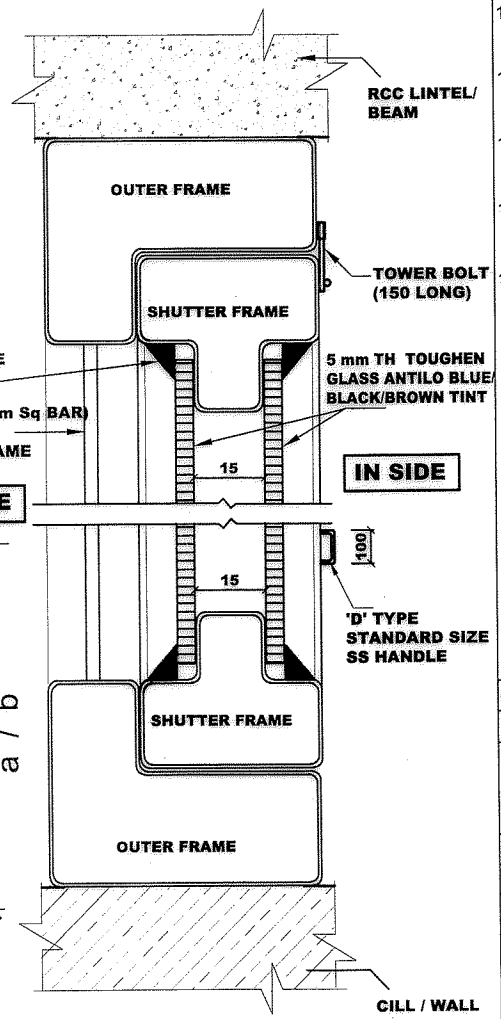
DETAIL OF OUTER SHUTTER FRAME (MADE OF ERW TUBE SECTION)
